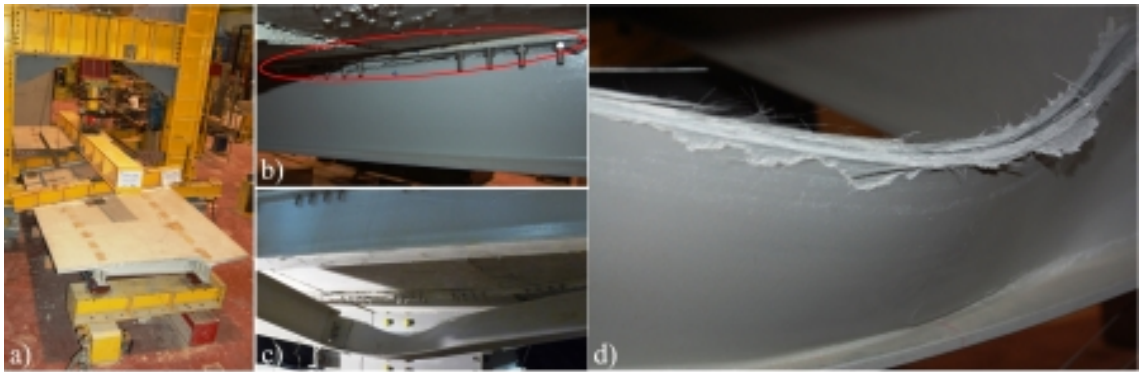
Small-scale prototype failure test: (a) prototype after failure; (b) GFRP main girder web-flange junction failure; (c) complete separation of web and flange followed by web buckling; and (d) detail of web-flange separation.
